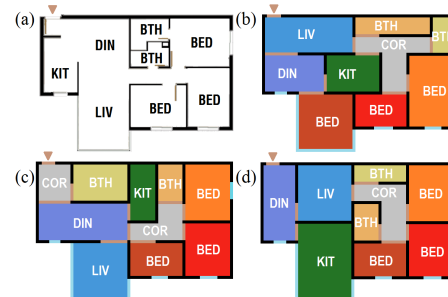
A floor plan generated by an architect (a) and three procedural floor plans created from a similar architectural plan (b-d).
